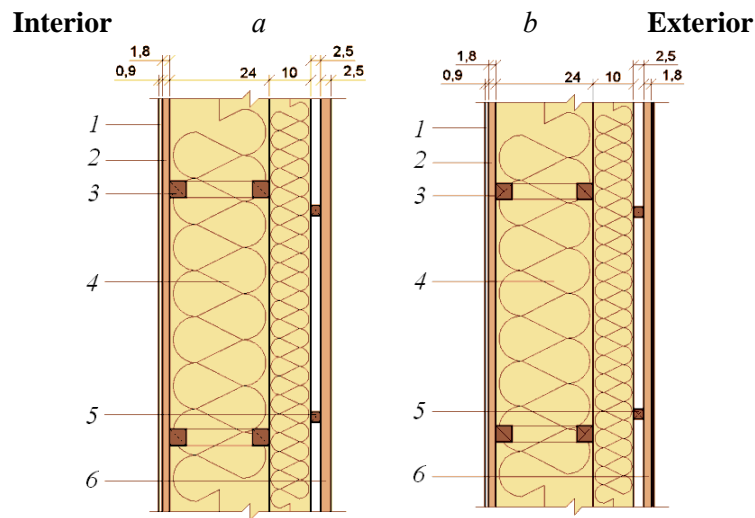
Exterior wall made of wood: *a* – wall closed on the exterior with wood panel of 2.5 cm thick; *b* – wall closed on the exterior with standing seam attached to a continuous support of OSB panels.
